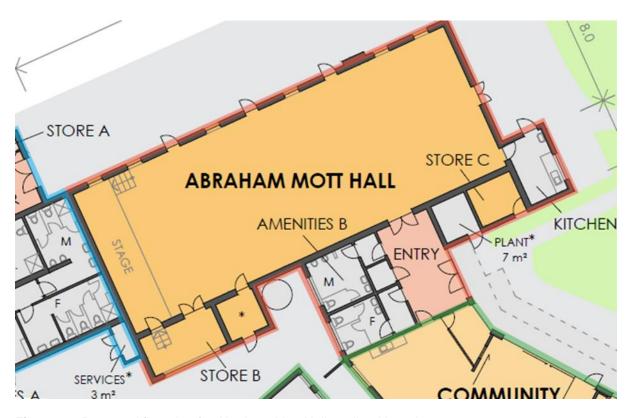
Proposed floorplan for Abraham Mott Hall, outlined in red
